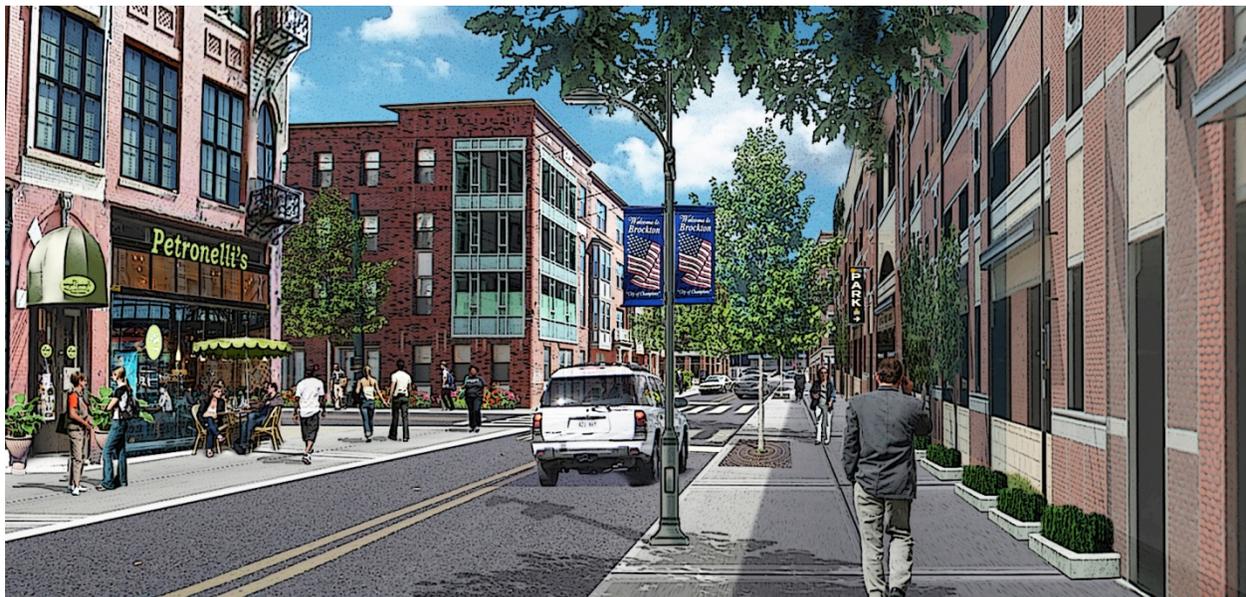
Perspective rendering of Petronelli Way – proposed parking garage at right.
